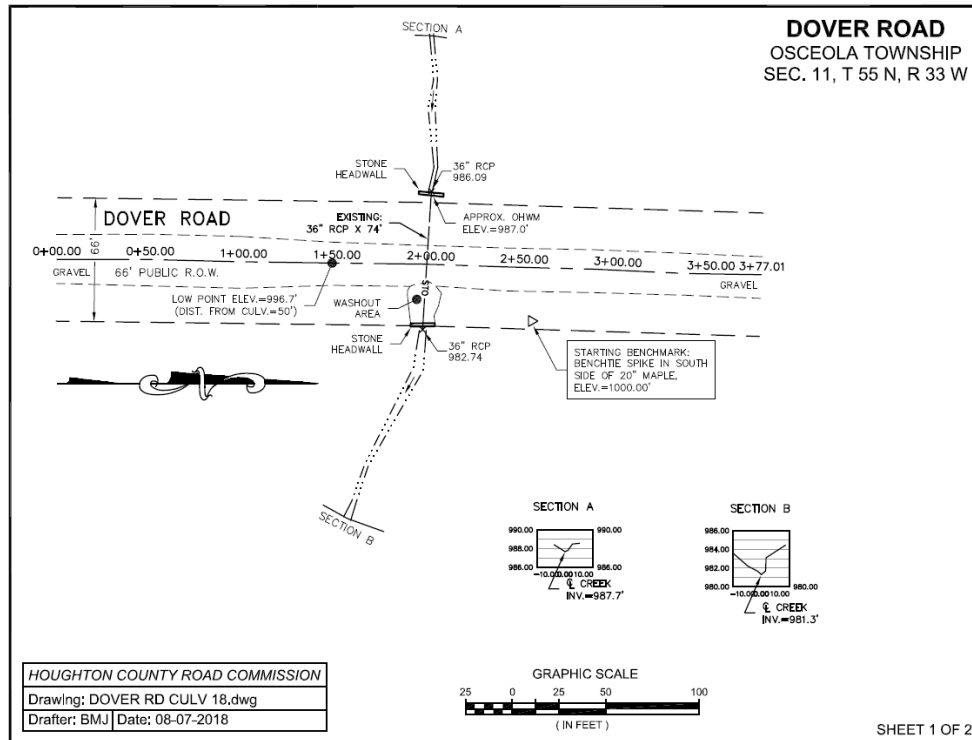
HCRC Dover Creek at Dover Rd. Culvert Plan [18].
